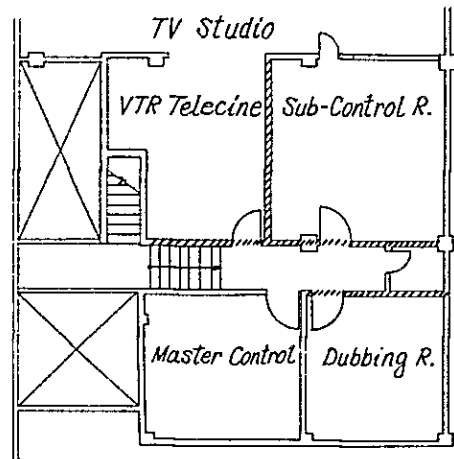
Sound Insulation Walls should be extended between ceiling and roof structure.
